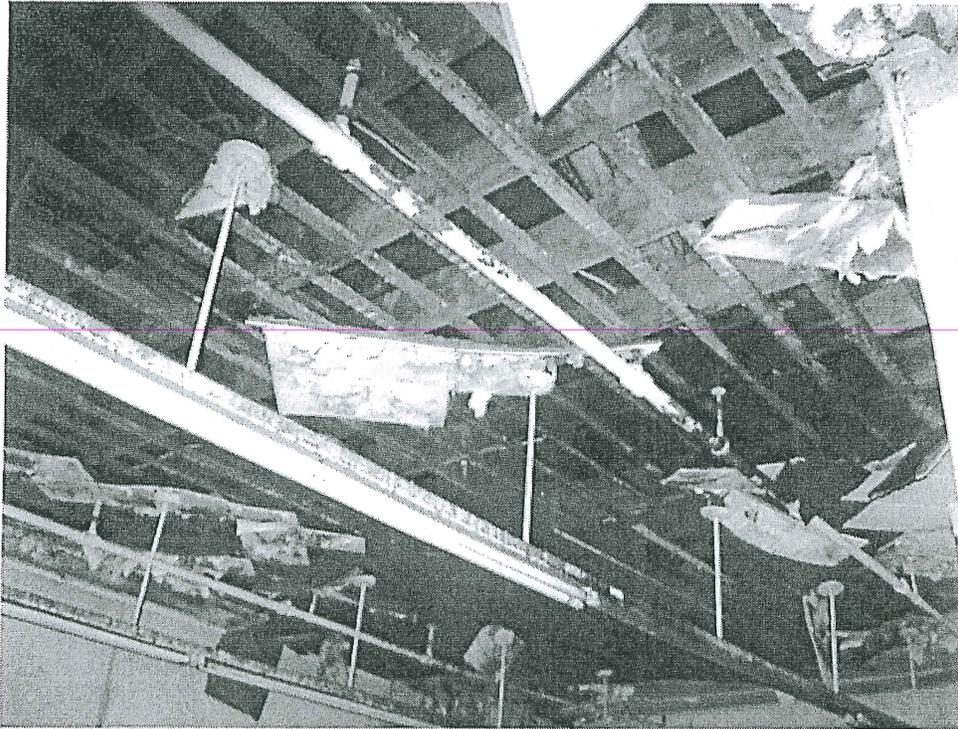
Roof framing at the north end of the Williams and Chester Bldg
